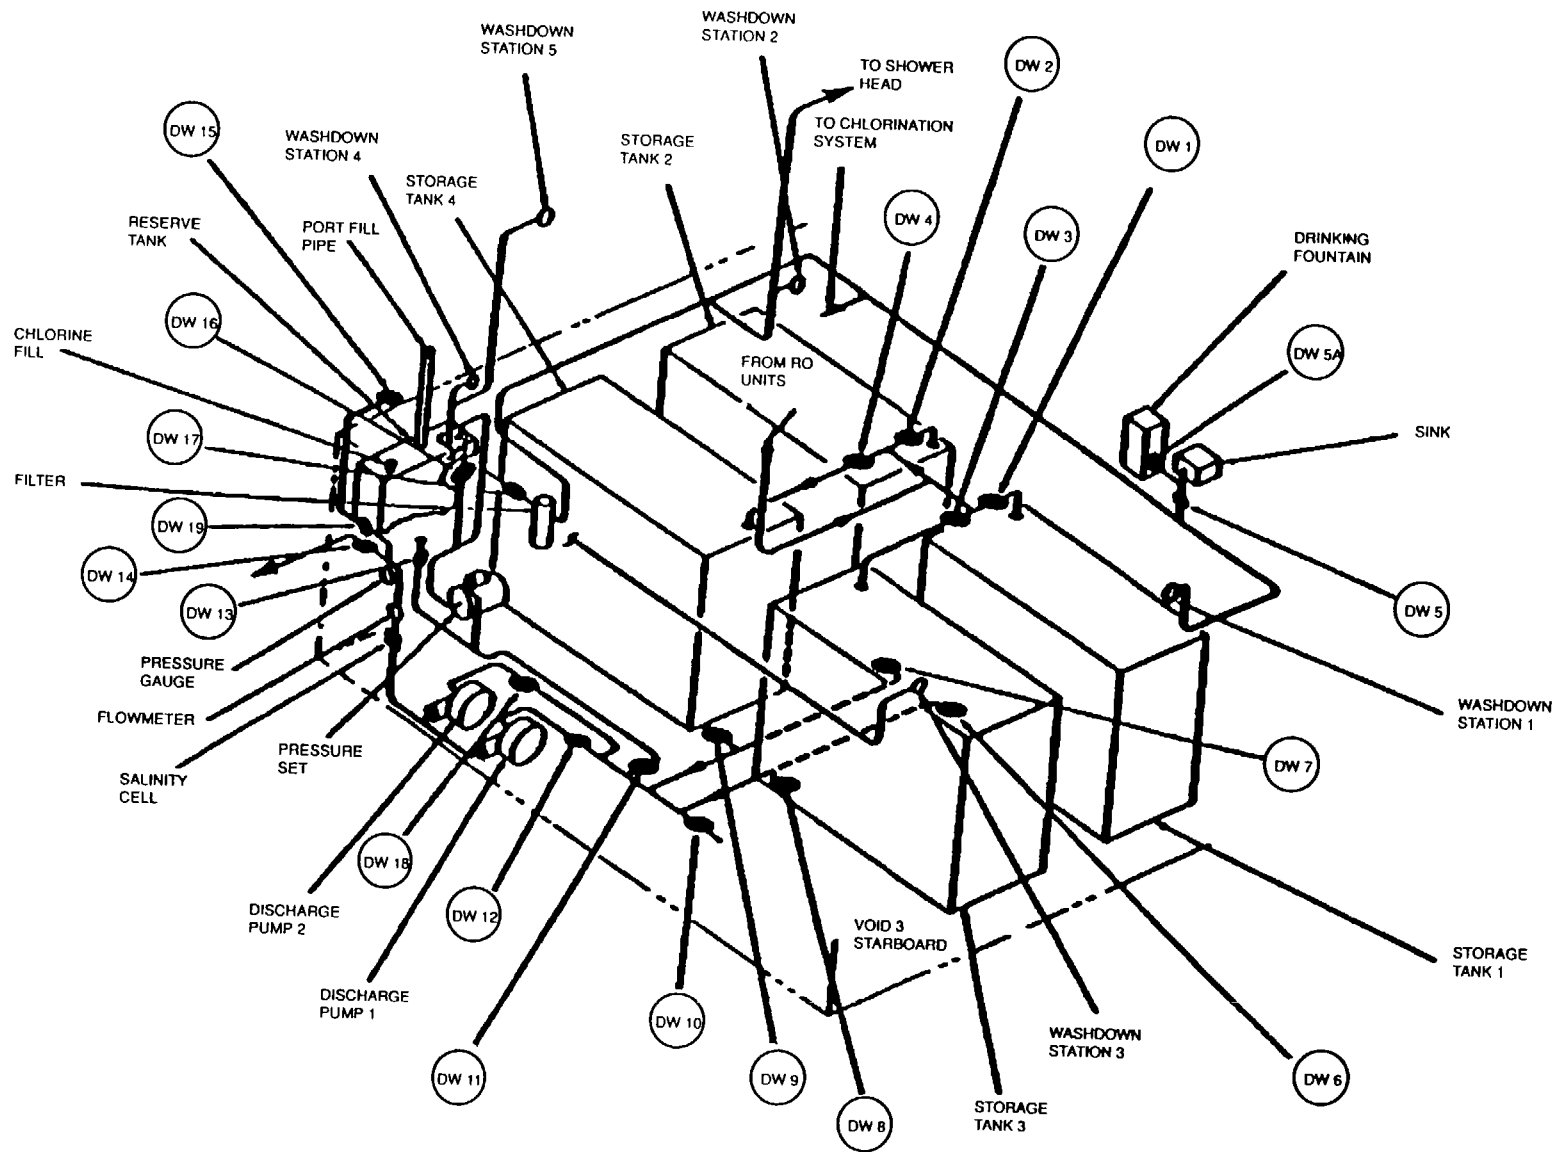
Drinking Water System Installation (Barges 2 and 3)
